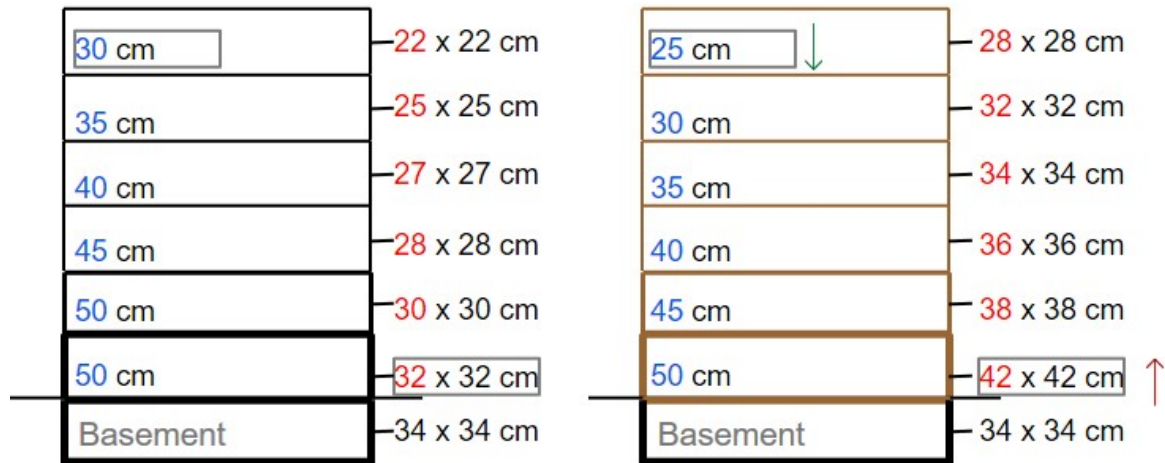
Changing column sizes and slab thicknesses based on material and floor height.
